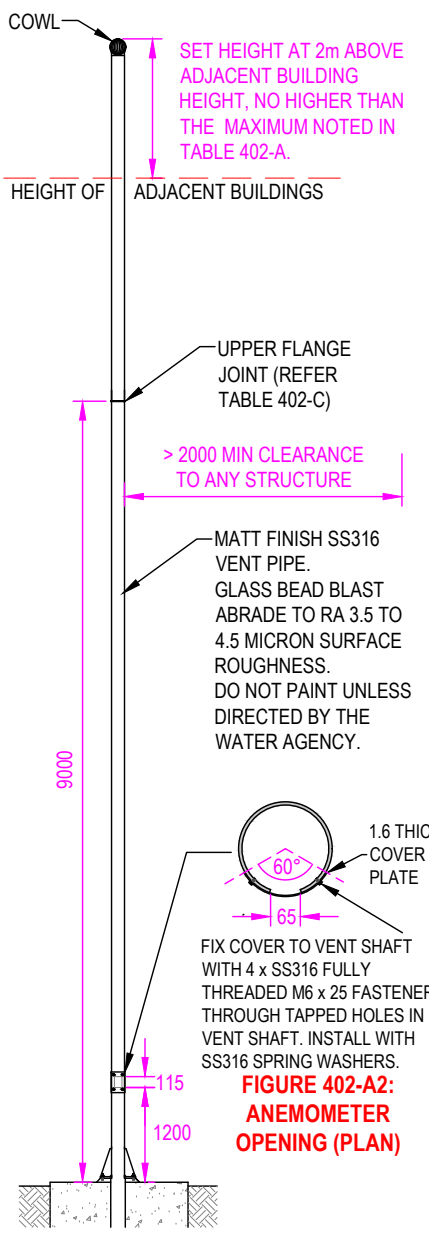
A1: VENT SHAFT (ELEVATION)
